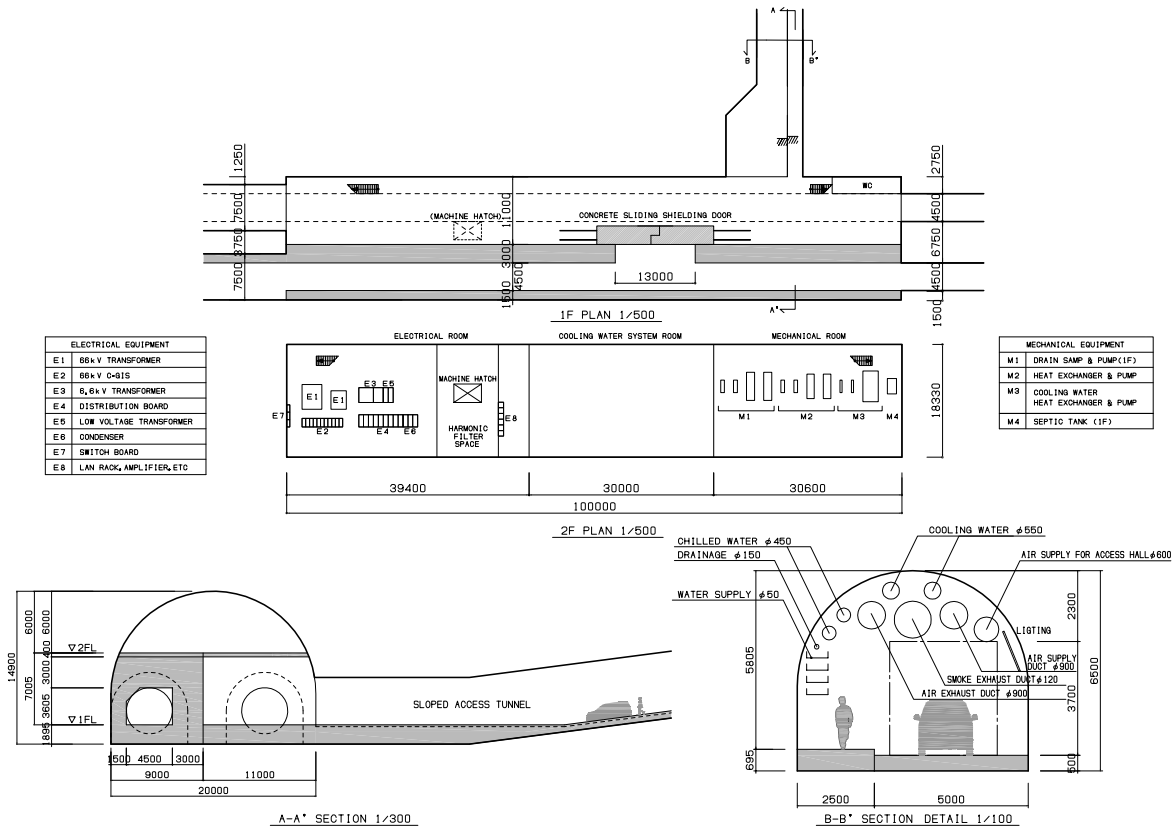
Detail of an access ramp for the Asian Sample Site.
